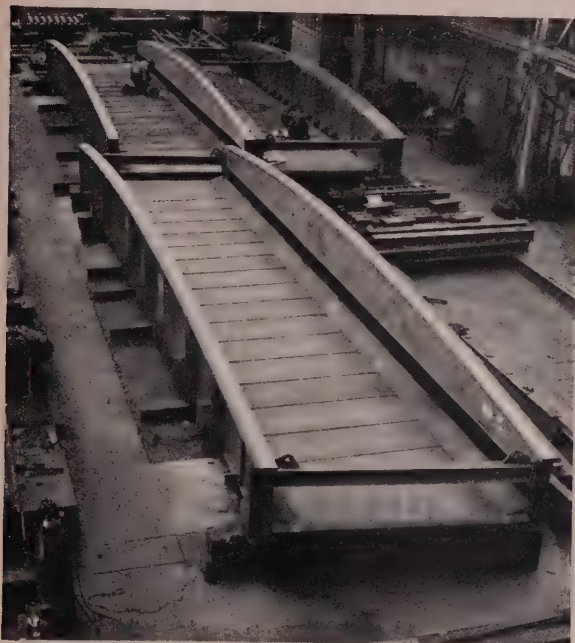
Stewarts Road Bridge. Assembly of spans in shops
